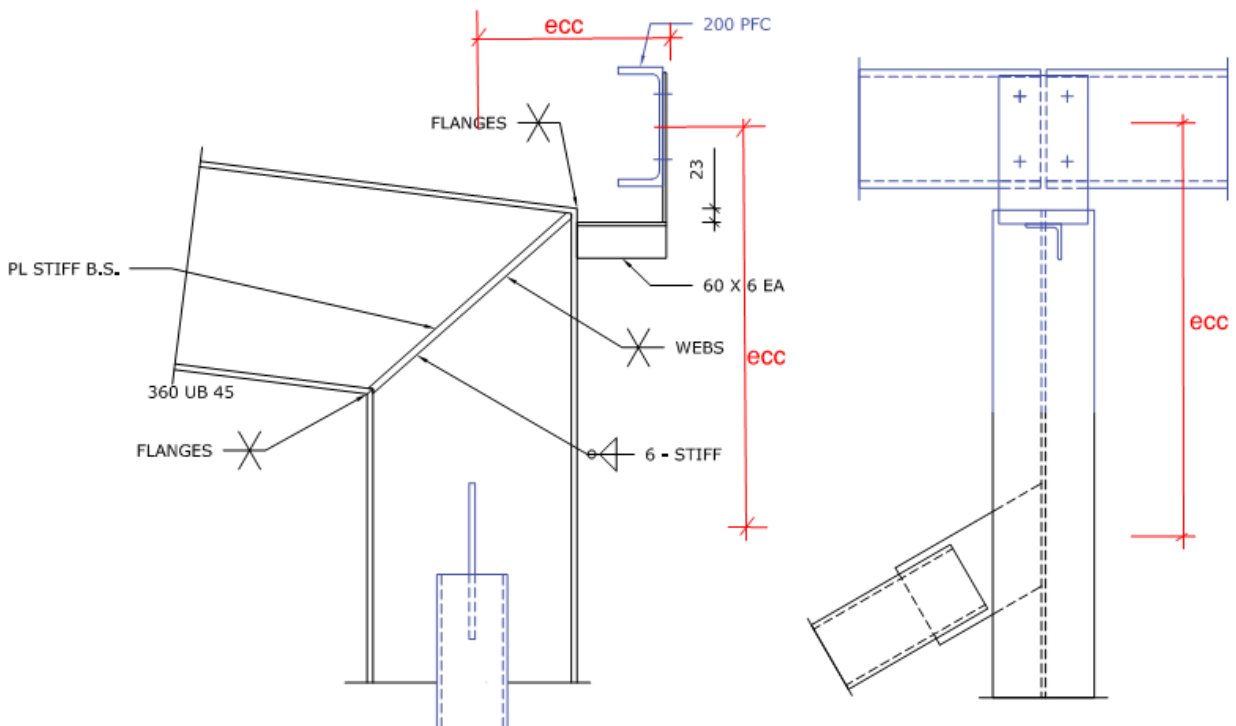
Connection of tension brace to strut (details from plans, blue elements added for clarity)
